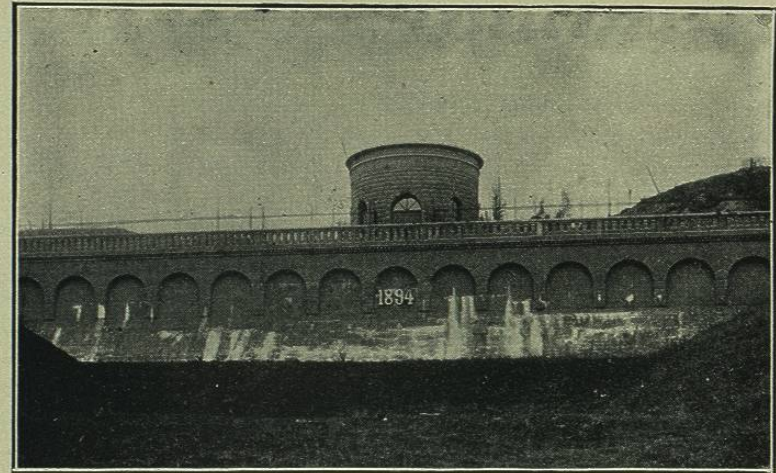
CONCRETE DAM OF RESERVOIR NO. 4, PORTLAND, OREGON., WATERWORKS.
